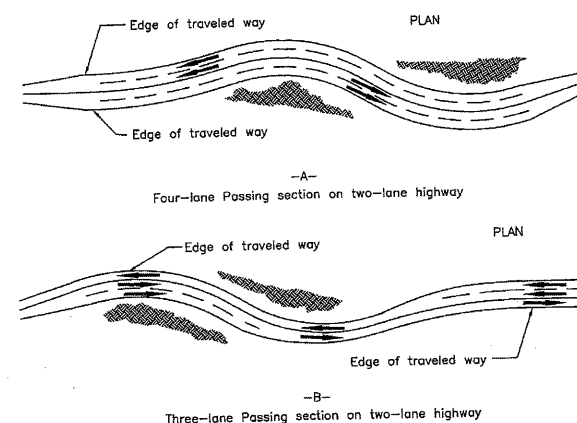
Passing Lanes Section on Two-Lane Roads
